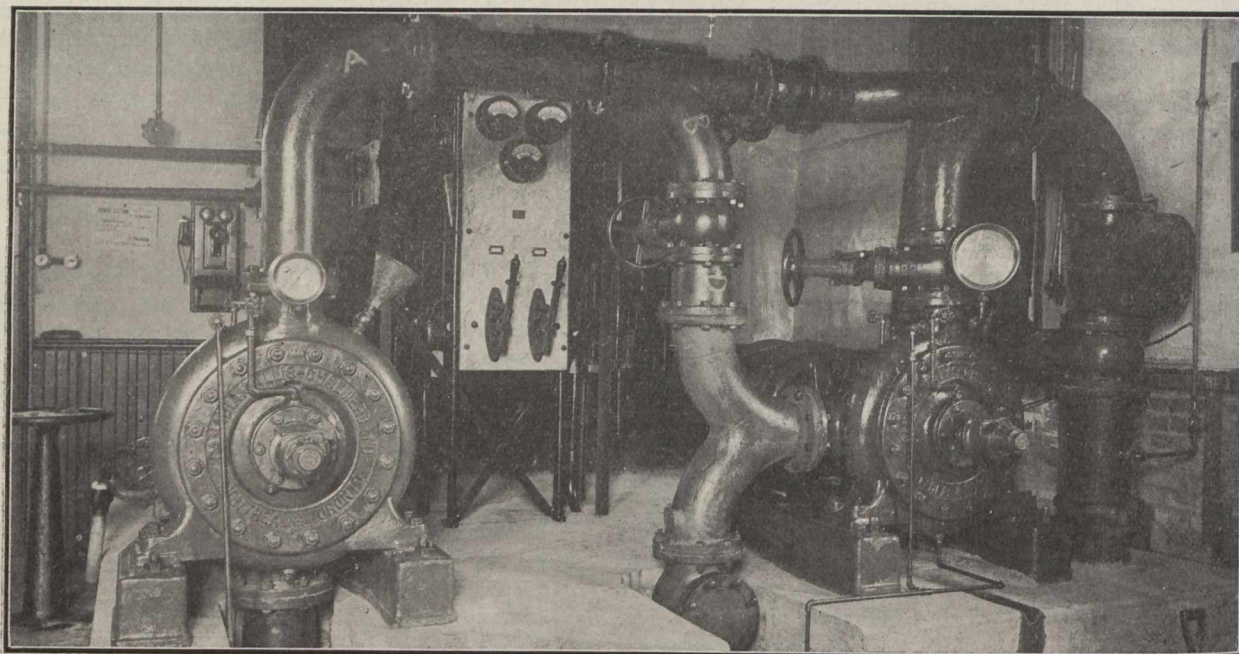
View of the New Installation at Bracebridge, Ont.
